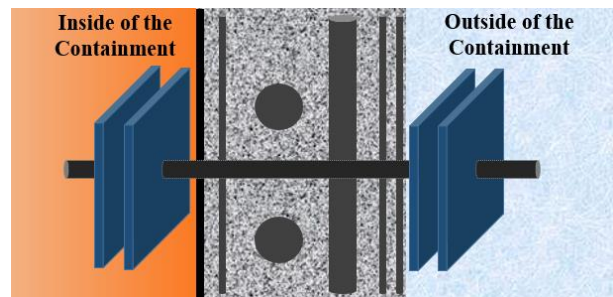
Schematic diagram of steel fins penetrating into containment wall of OPR1000.
